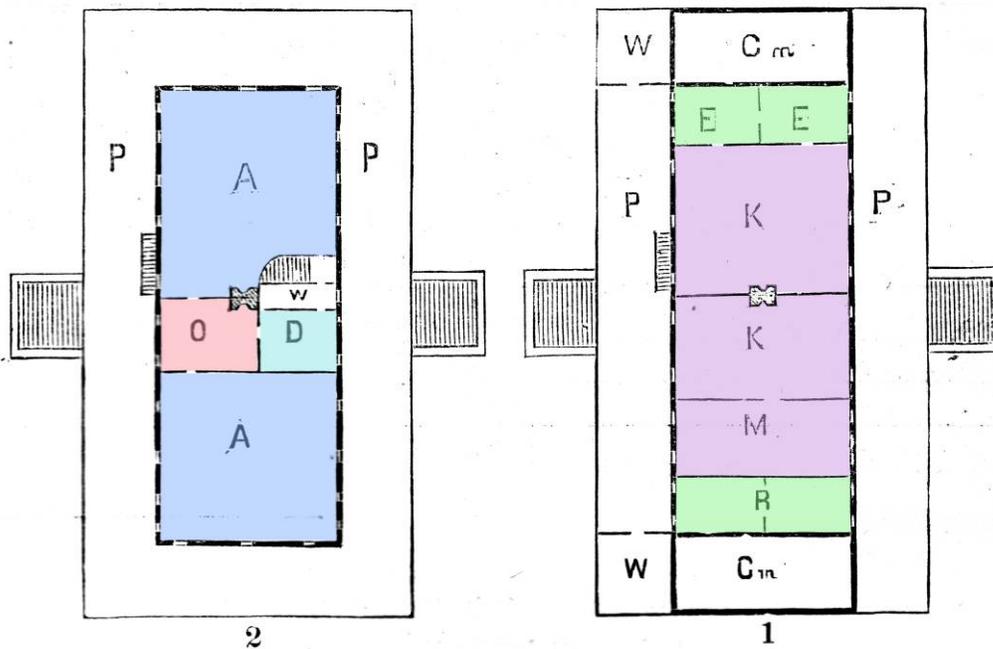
Key West Barracks, Florida hospital floor plan 1875 (Circular #8).
